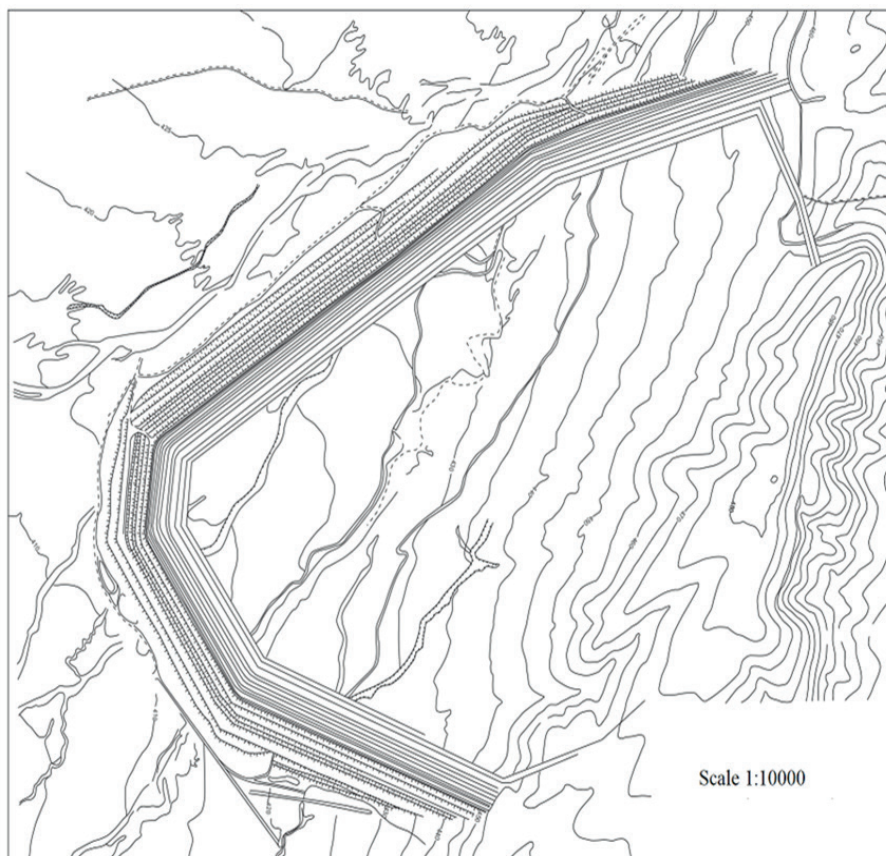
Surface plan of Bayaldyr tailings dump at the time of construction
